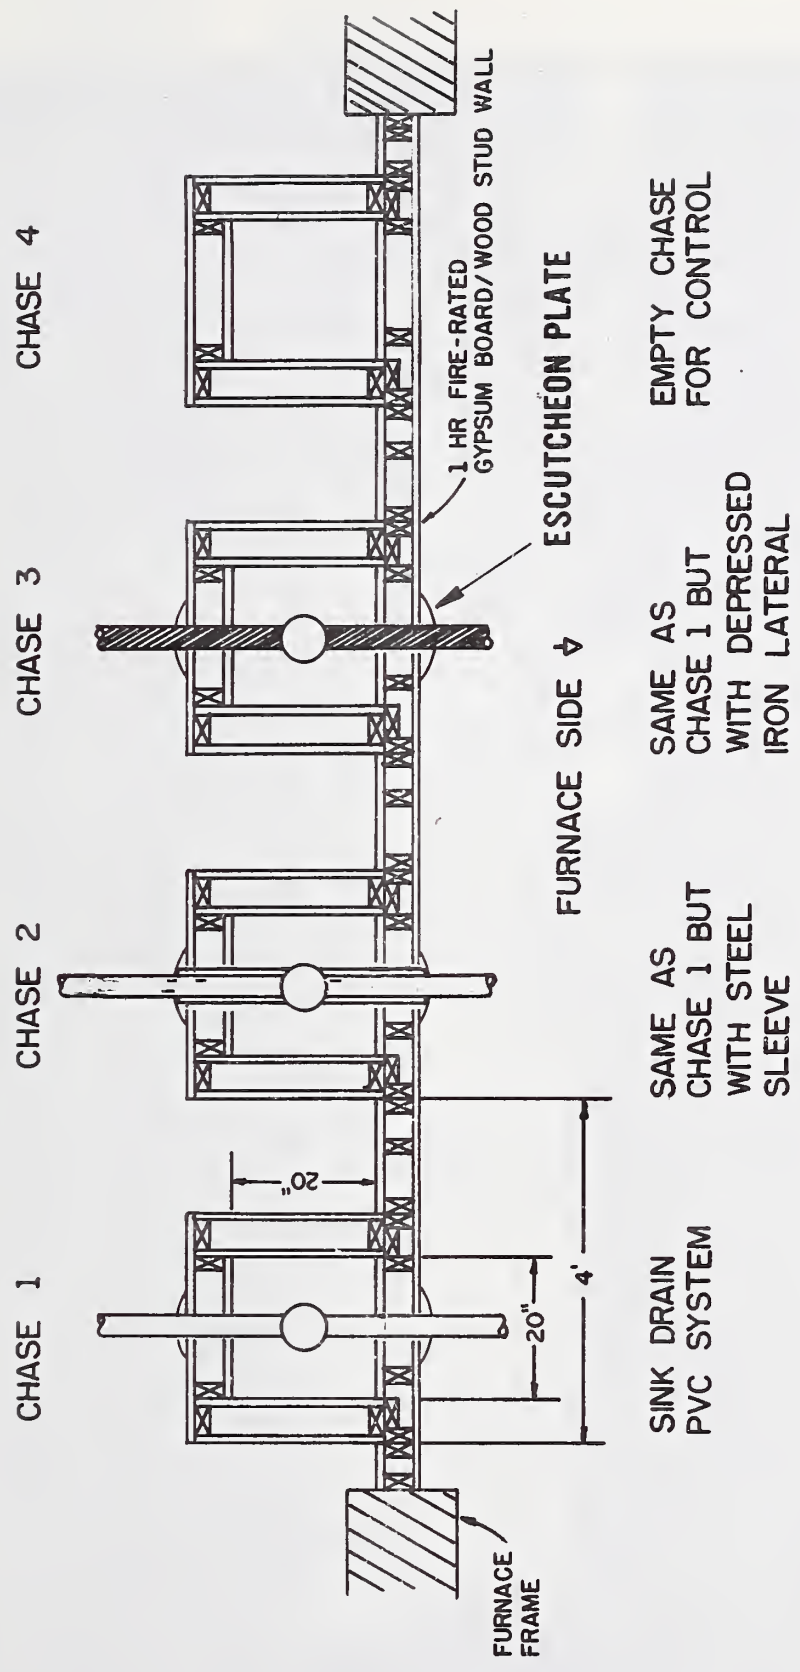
Plan View of Wall and Pipe Chases for Test 1.
